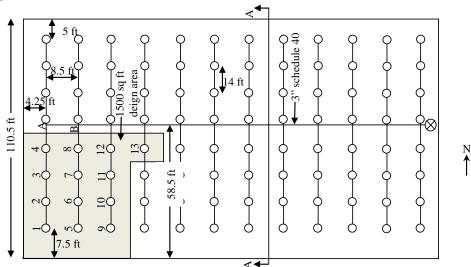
Plan View for Hydraulic Calculation Portion of Exam
